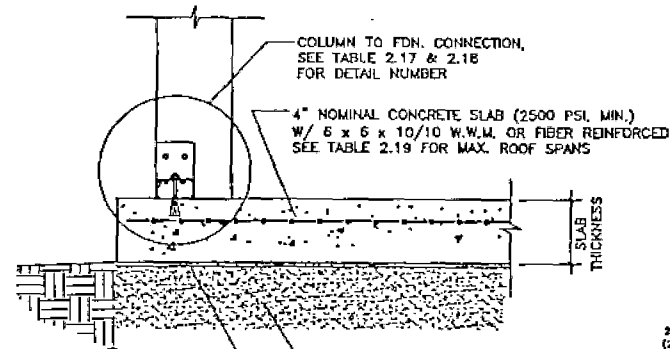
TYP. CONTINUOUS PERIMETER FOOTING (SEE TABLE 2.20)
